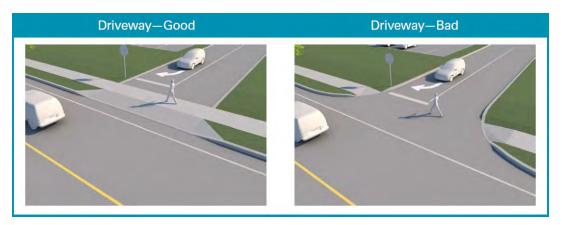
Sidewalk and Driveways (Source: CSDG)
